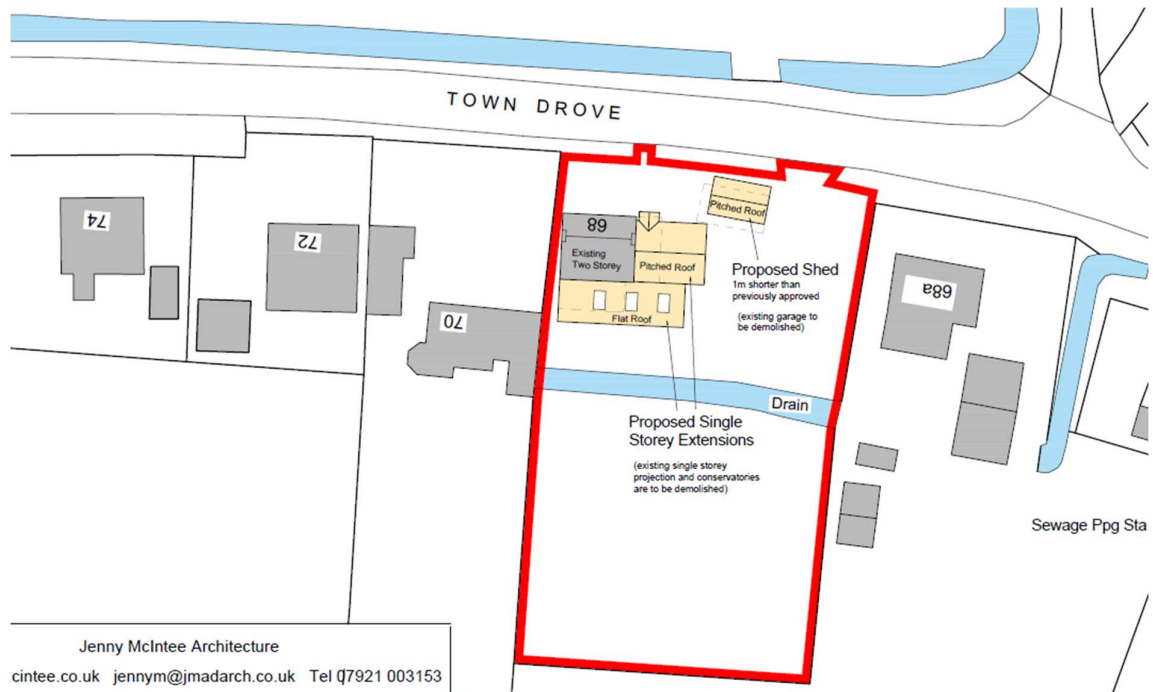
Site Block Plan showing proposed single-storey extensions in context
